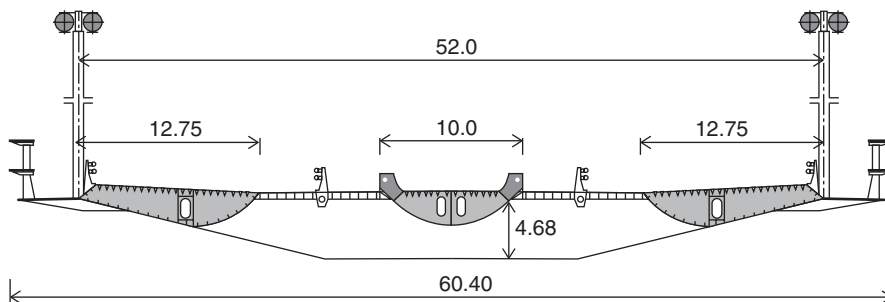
Cross section of the deck in the Tataru Bridge
